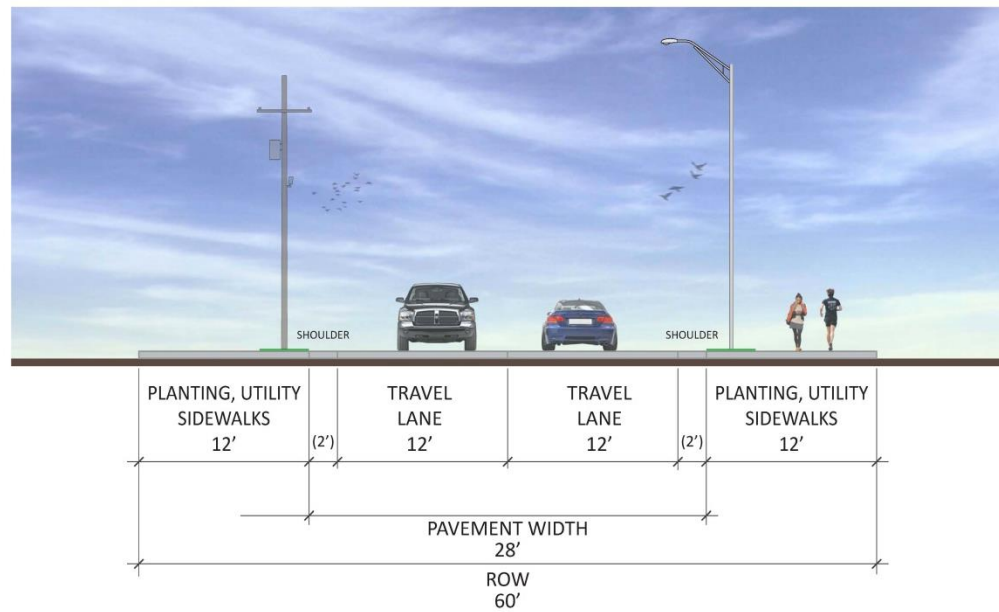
Urban Major and Minor Collector Street Cross-Section
